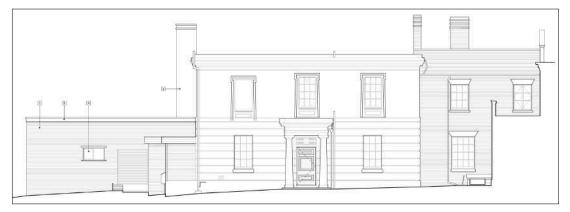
Proposed north elevation. Image courtesy of Michael Cruise Architects.
